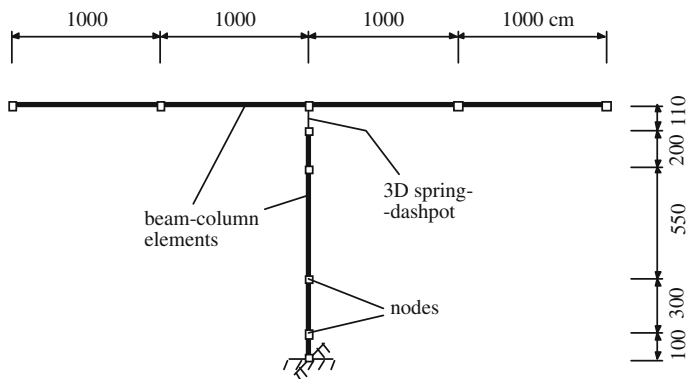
Detailed three-dimensional model of a single pier section of the bridge
